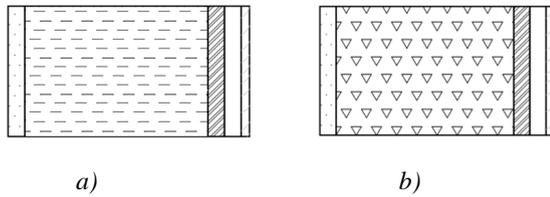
Wall assemblies at the ORNL testing facility in Charleston.
